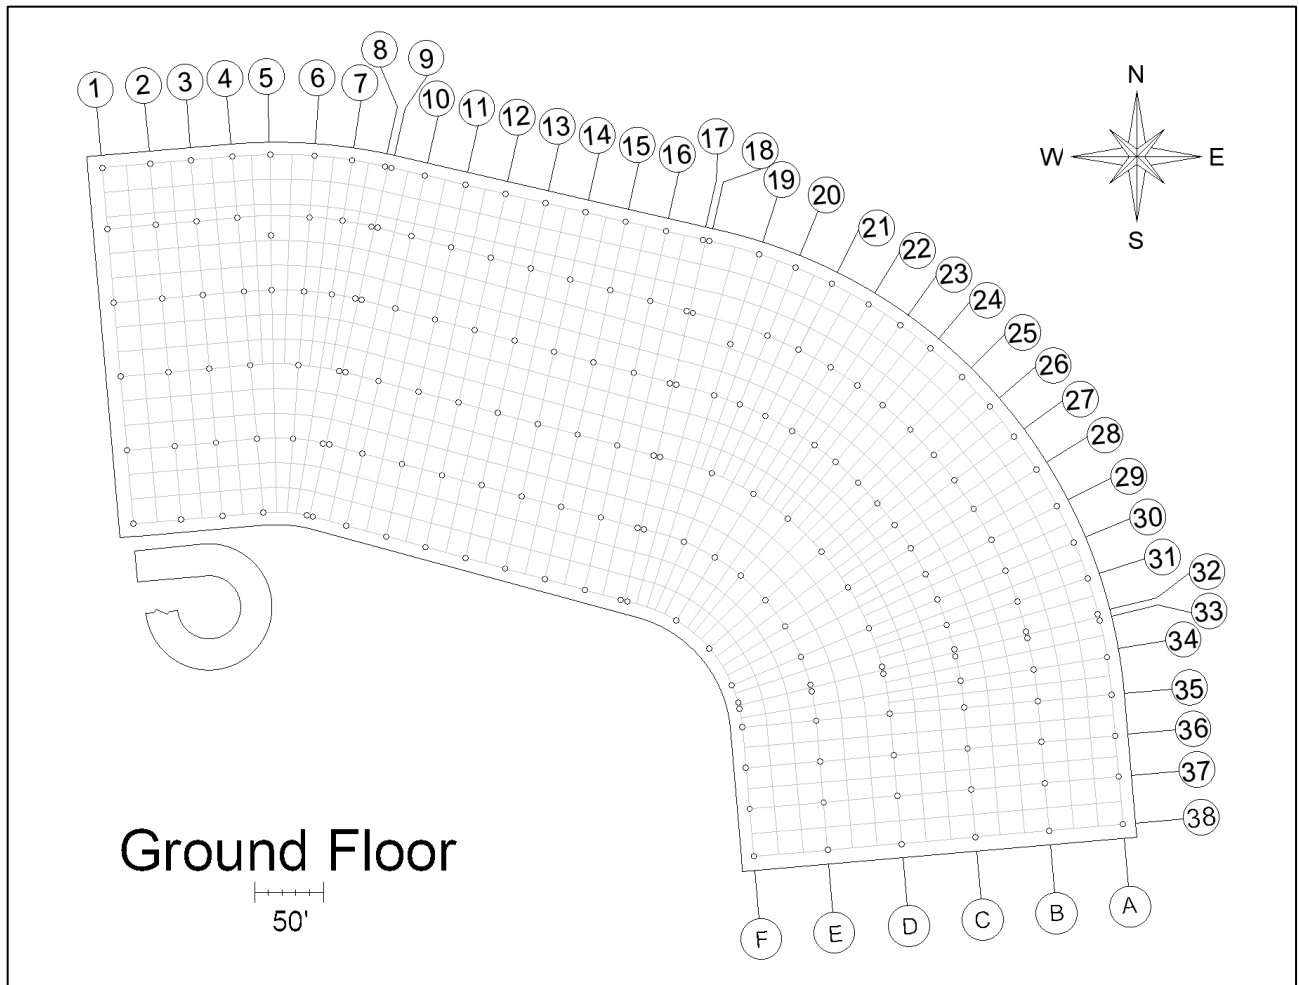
Parking garage layout of the ground floor SOG showing the column location identification A-F and 1-38. Saw-cut joints (only on ground floor) are shown as the gray lines between columns.
